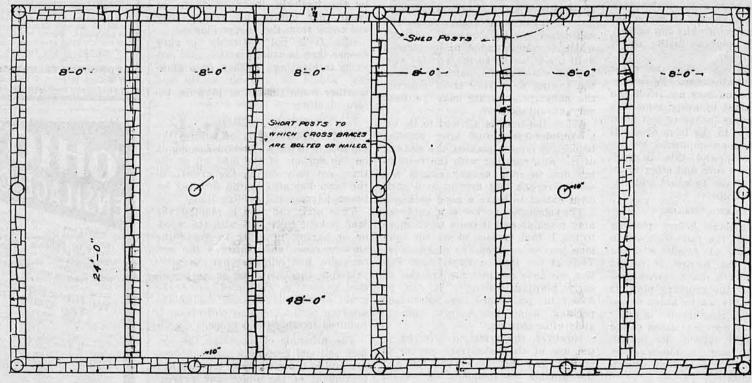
Ground plan. (Walls do not extend lengthwise of shed, as shown in plan, but the spaces between cross-walls are left open for ventilation.)
